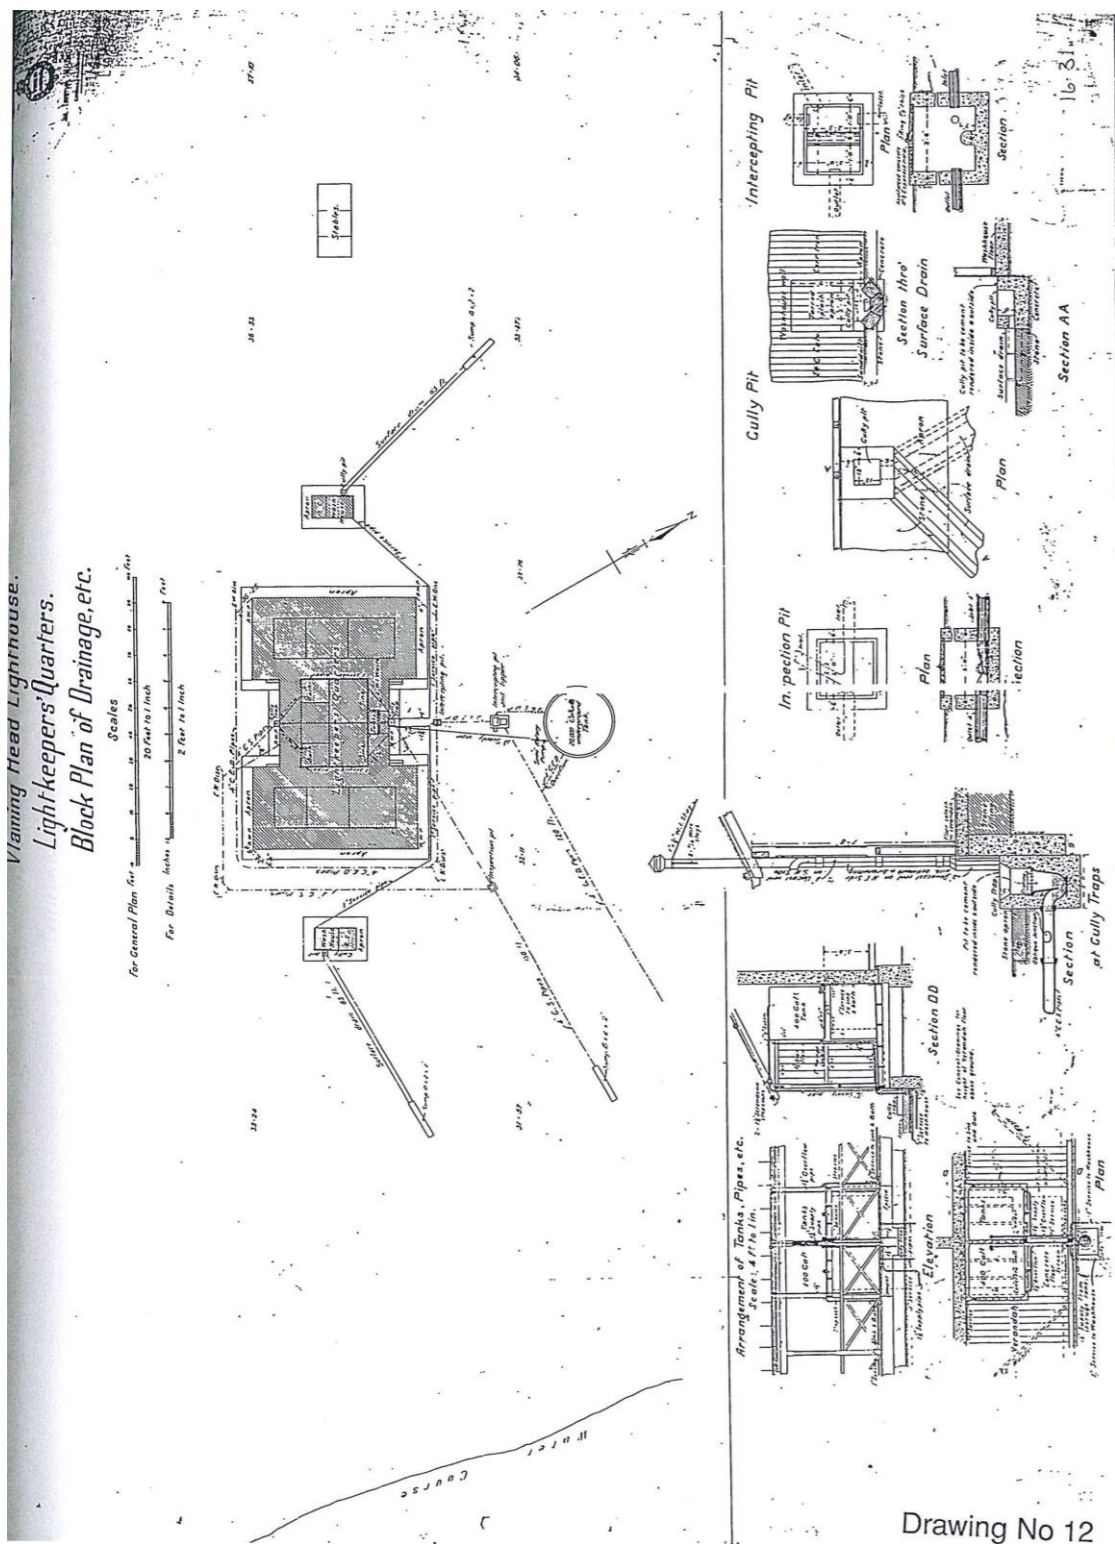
Lightkeepers Quarters Drainage Plan, Keen C, Conservation Plan
